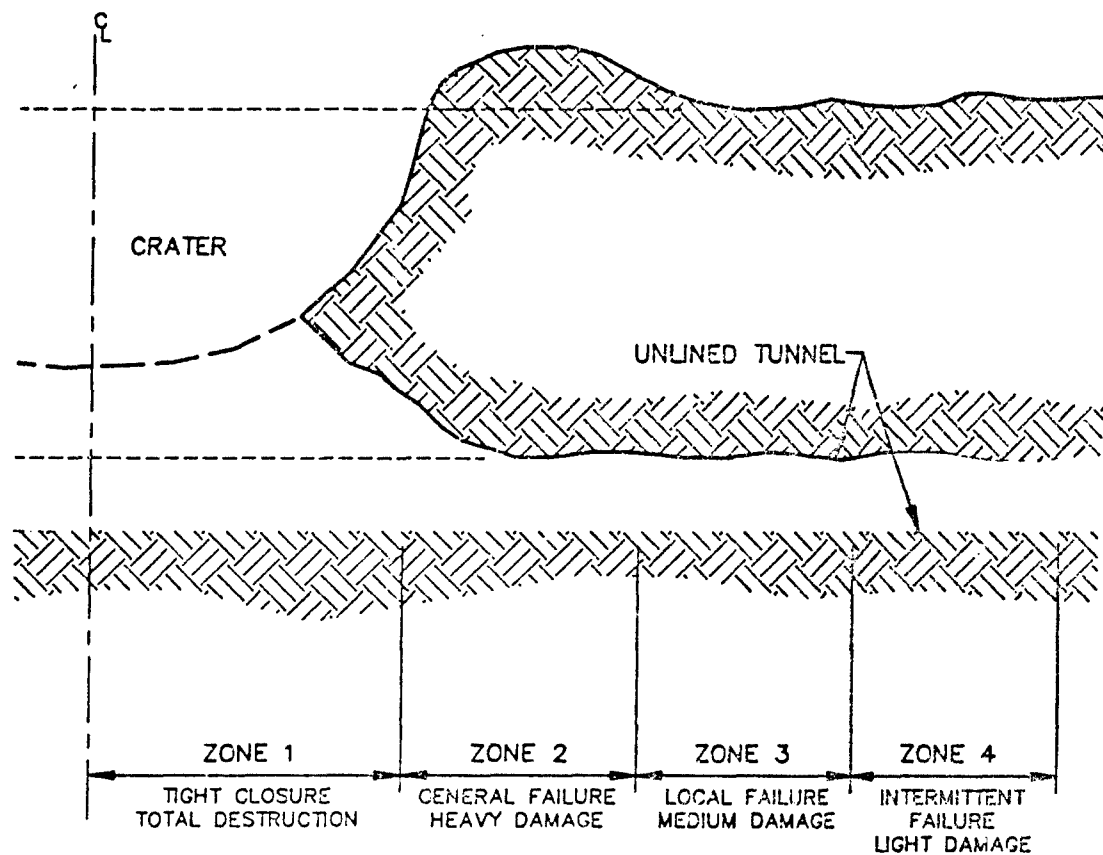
DAMAGE ZONES IN UNLINED TUNNEL TESTS.
